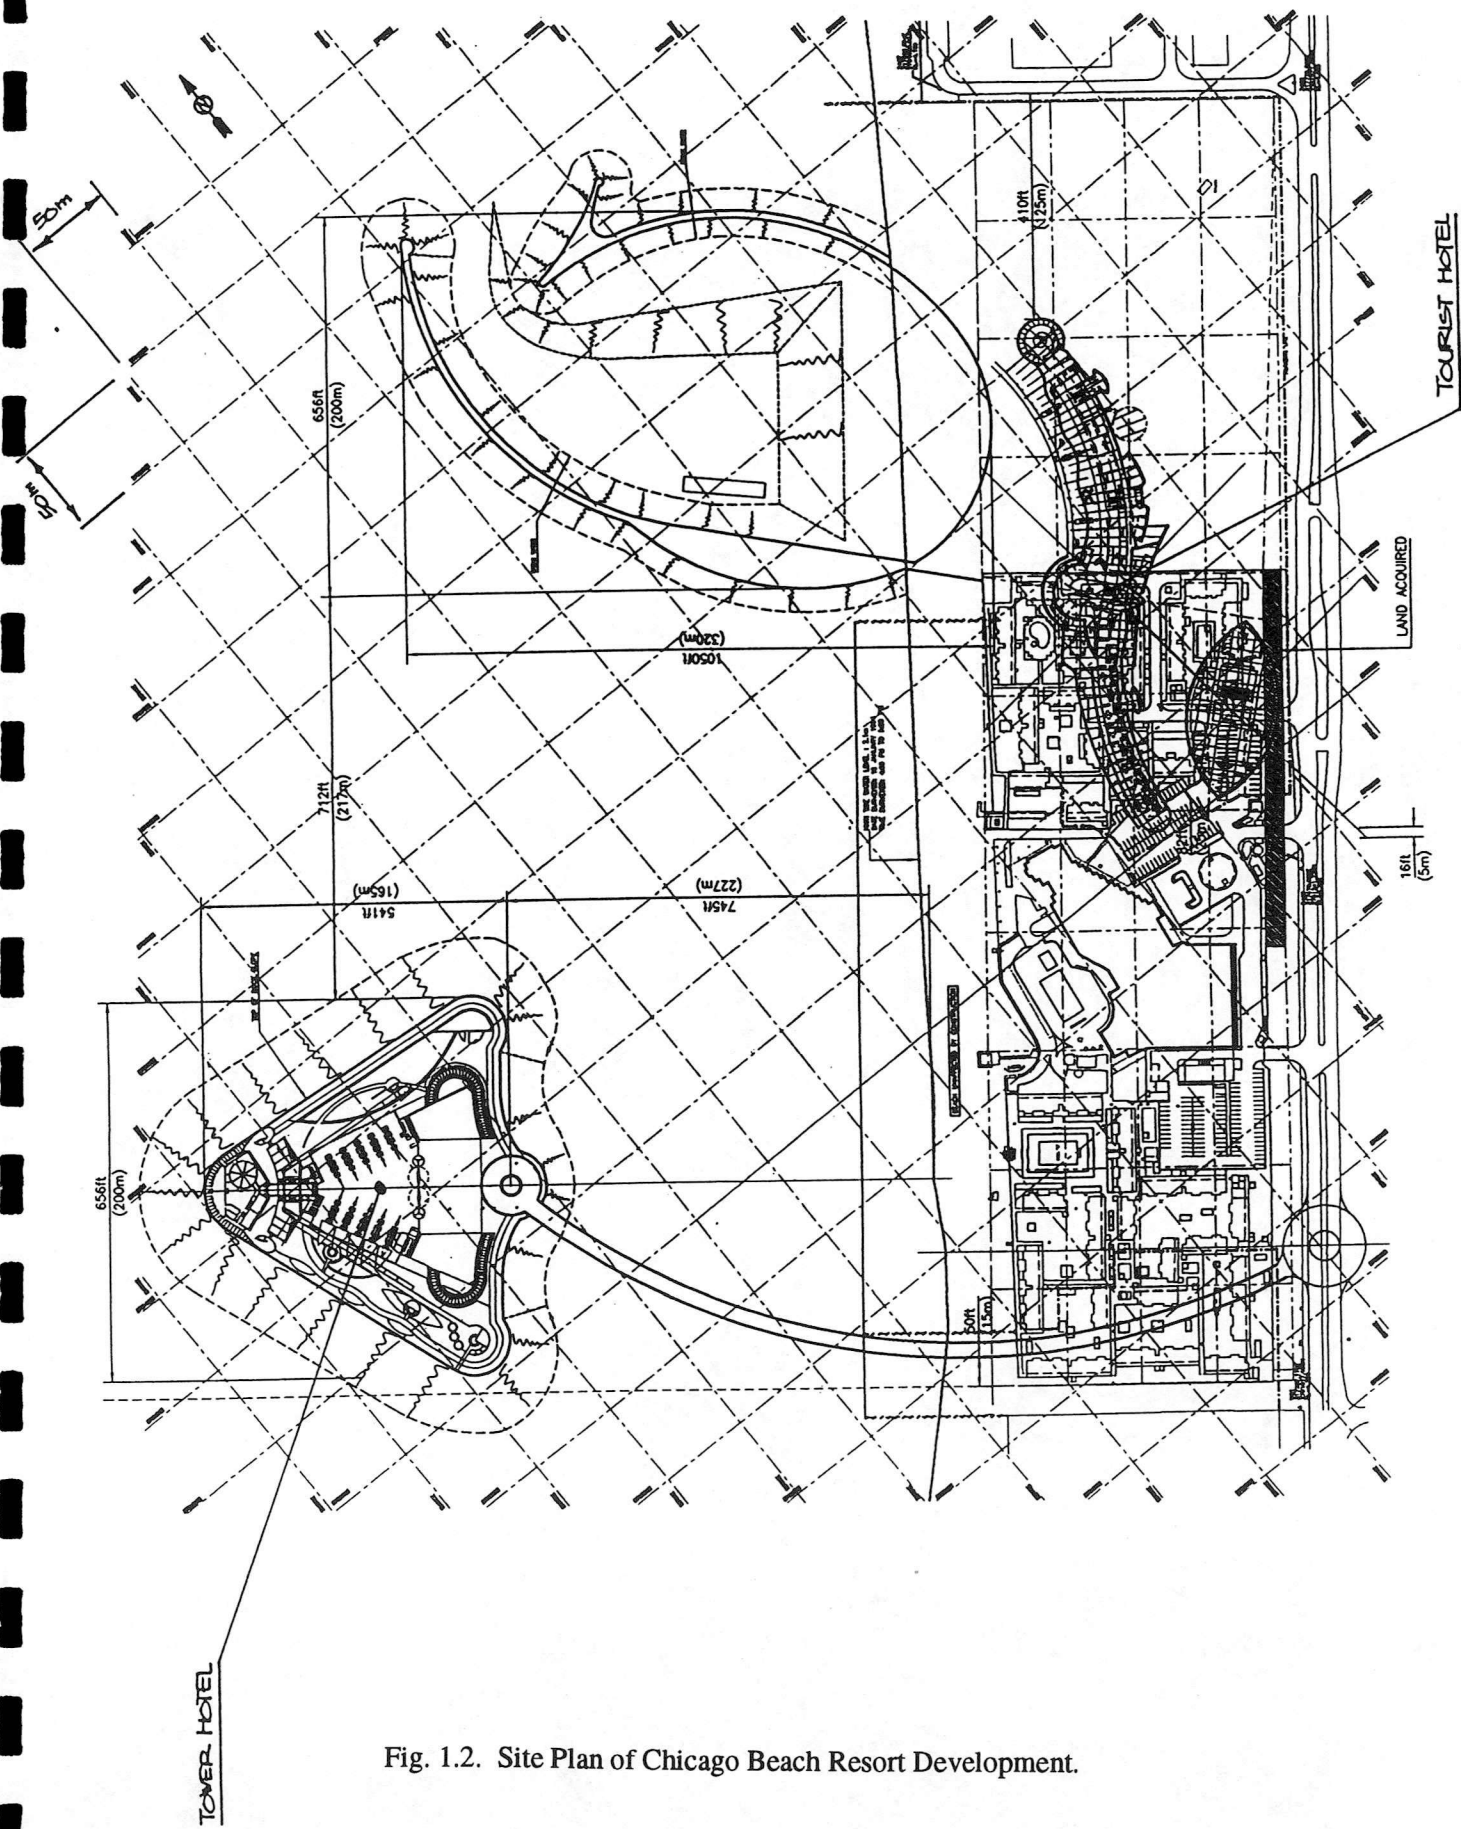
Site Plan of Chicago Beach Resort Development.
